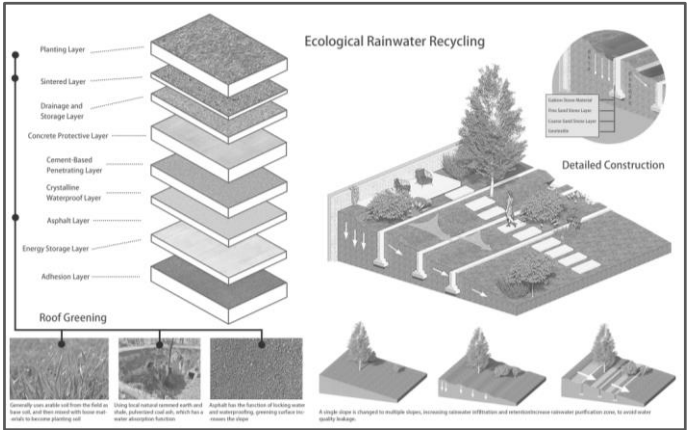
Green Roof and Water-Saving Design (Source: Hand-drawn)
